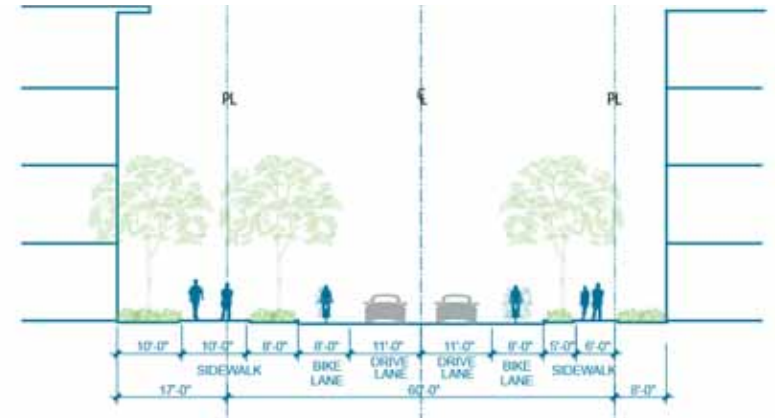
WELDON AVENUE STREETScape IMPROVEMENT SECTION
